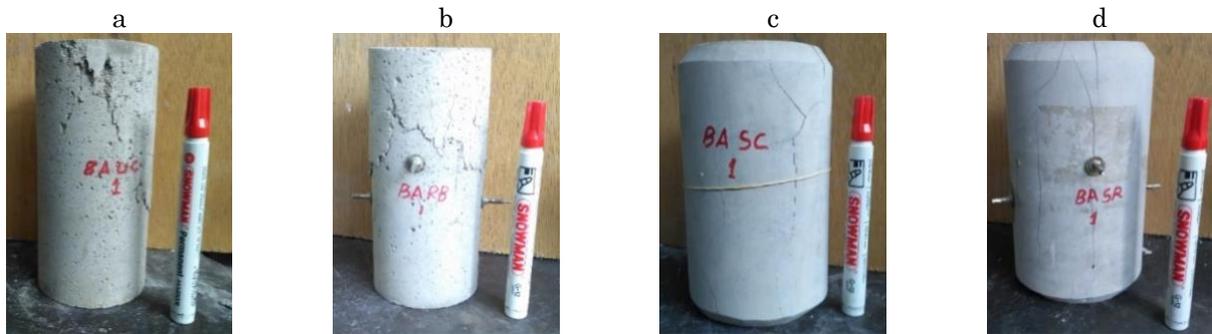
Examples of failure modes on pillars (a. Pillar without reinforcement, b. Pillar with rock bolt reinforcement, c. Pillar with shotcrete reinforcement, d. Pillar with combination of rock bolt and shotcrete reinforcement)
